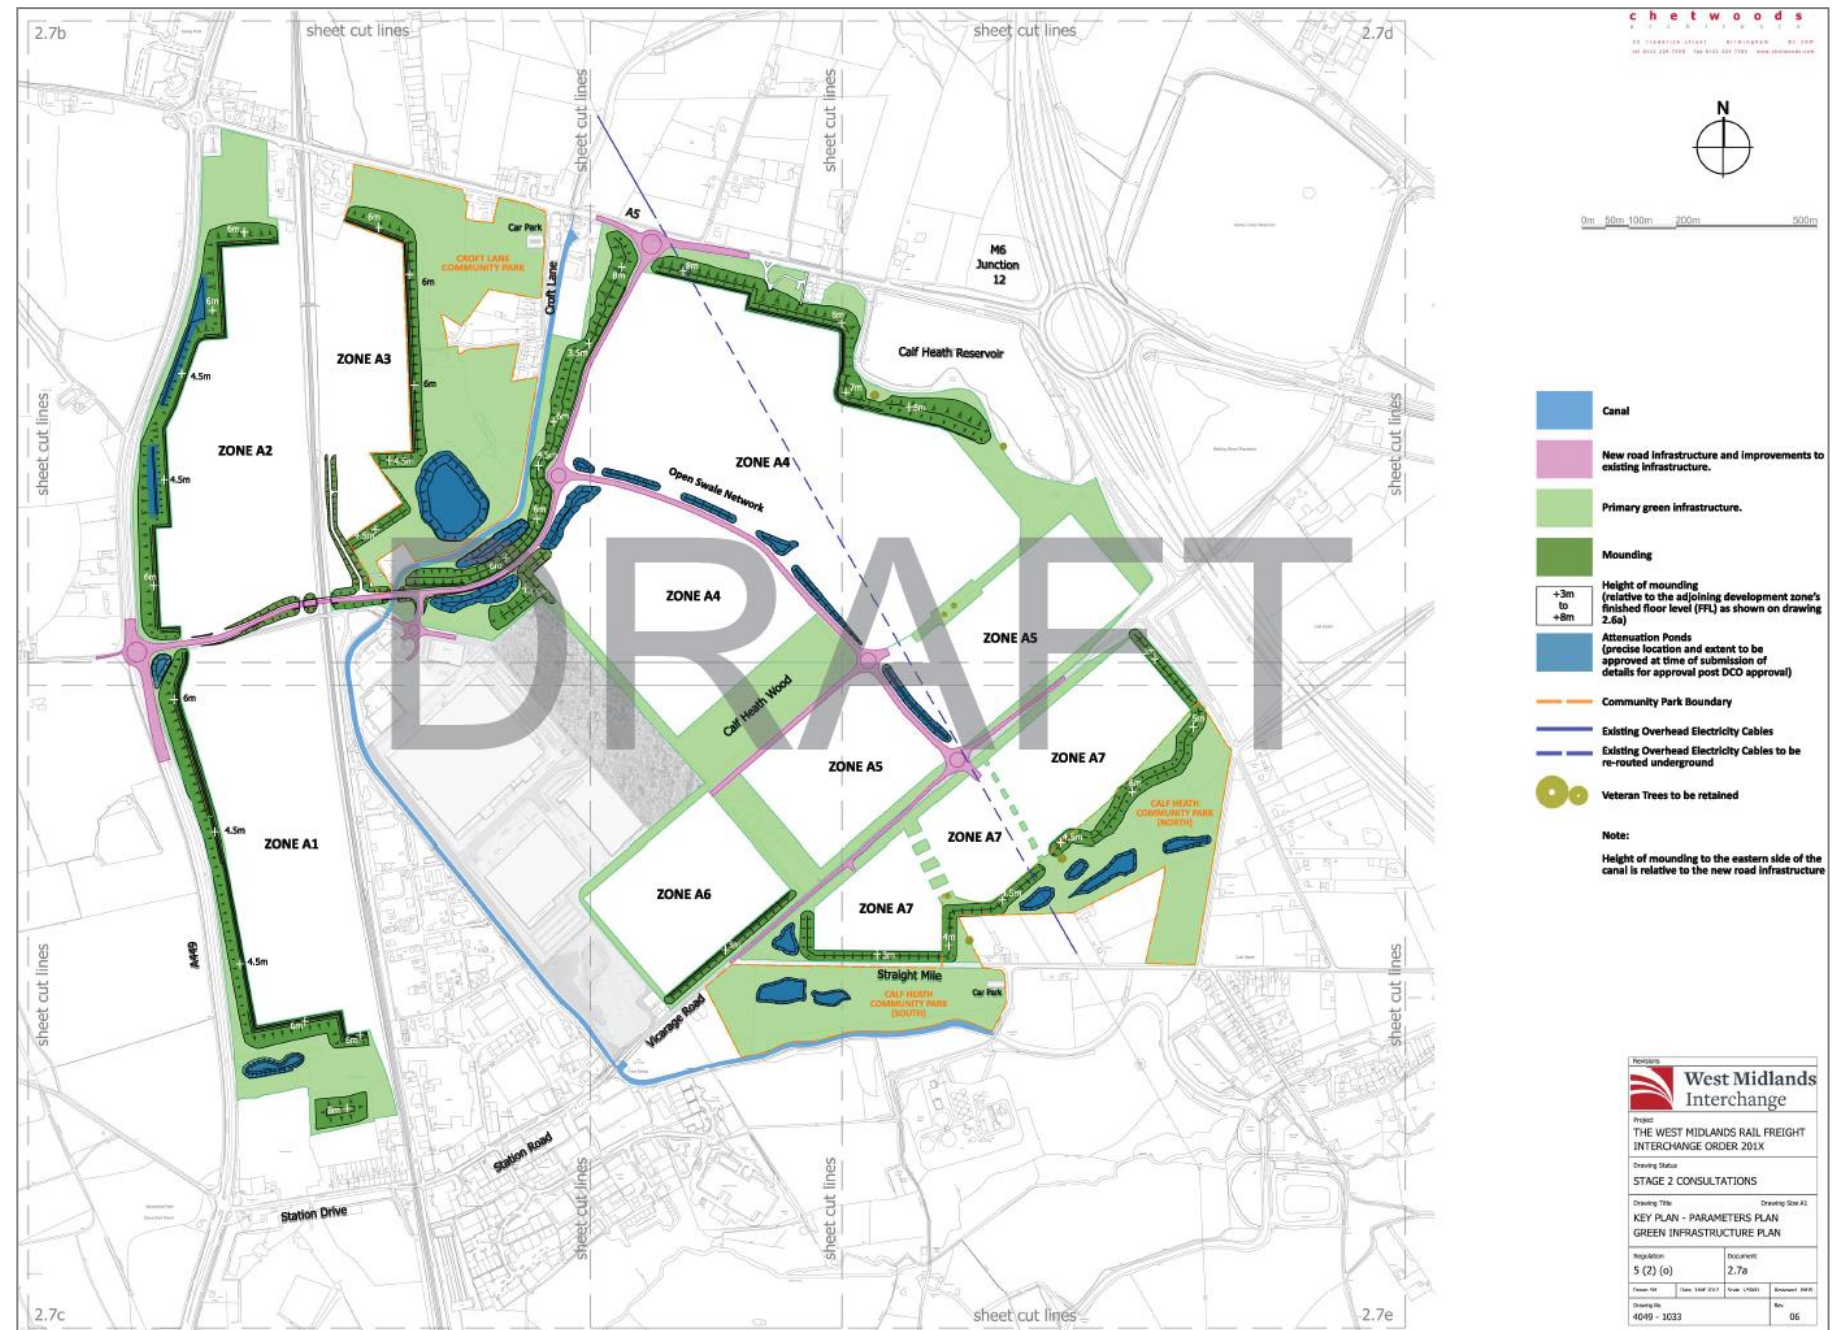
Stage 2 Green Infrastructure Parameter Plan
